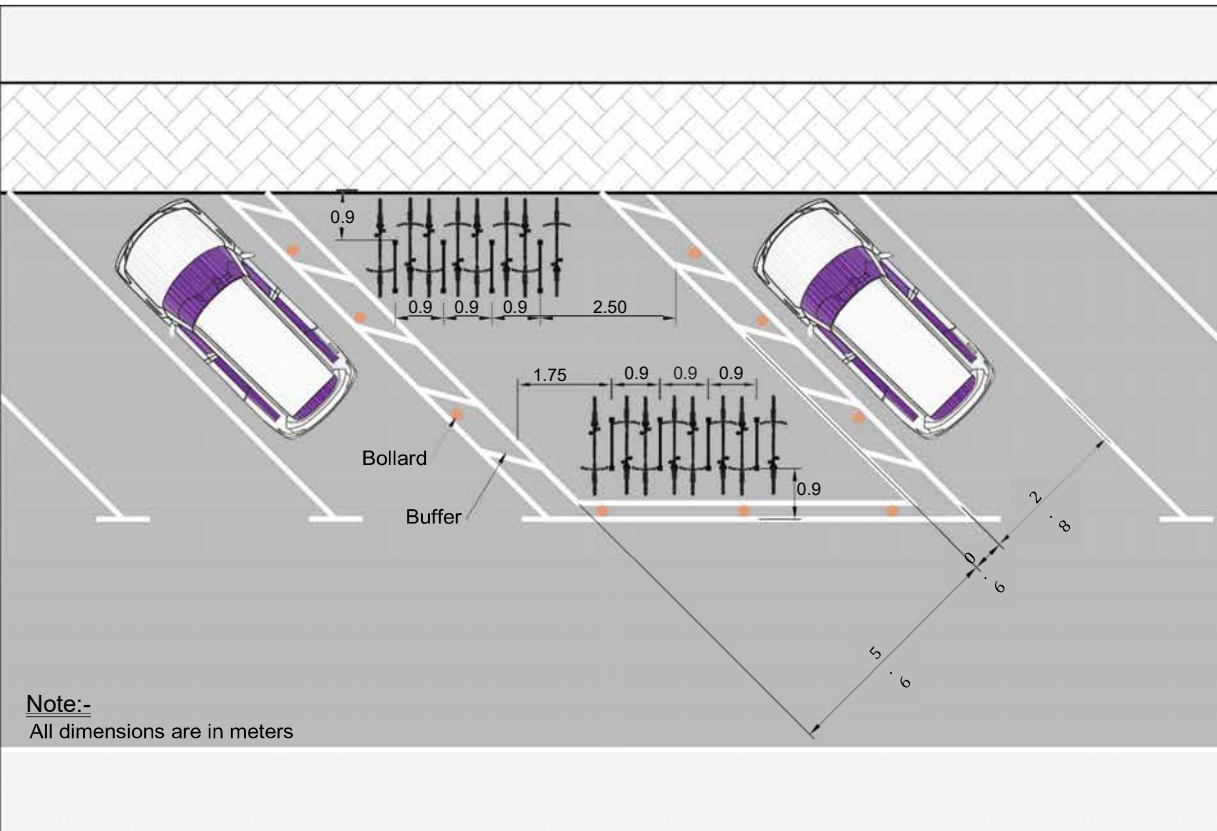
Typical Layout for Bicycle Parking in Converted Angular On-Street Car Parking Space
